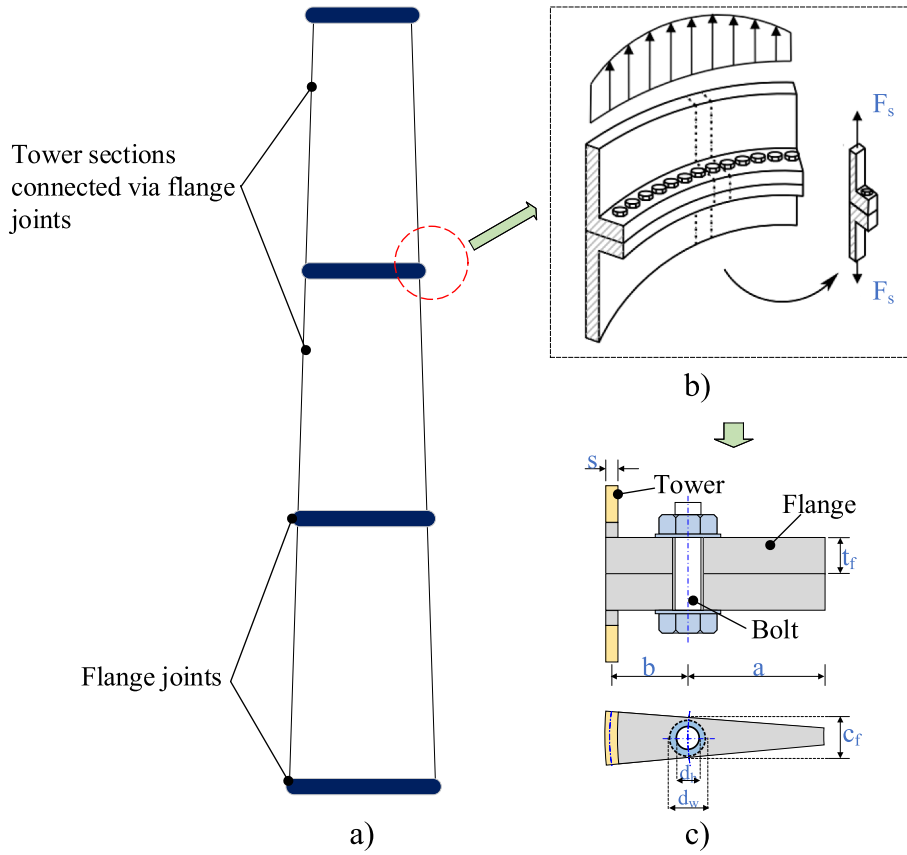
Diagram of Flange joint: (a) Steel Tower, (b) Segment Approach [16], and (c) Flange Geometry.
